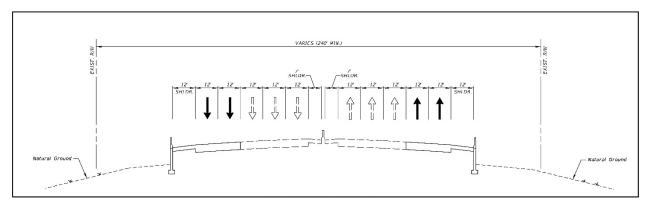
Proposed Roadway Typical Section – I-10 (SR 8)
